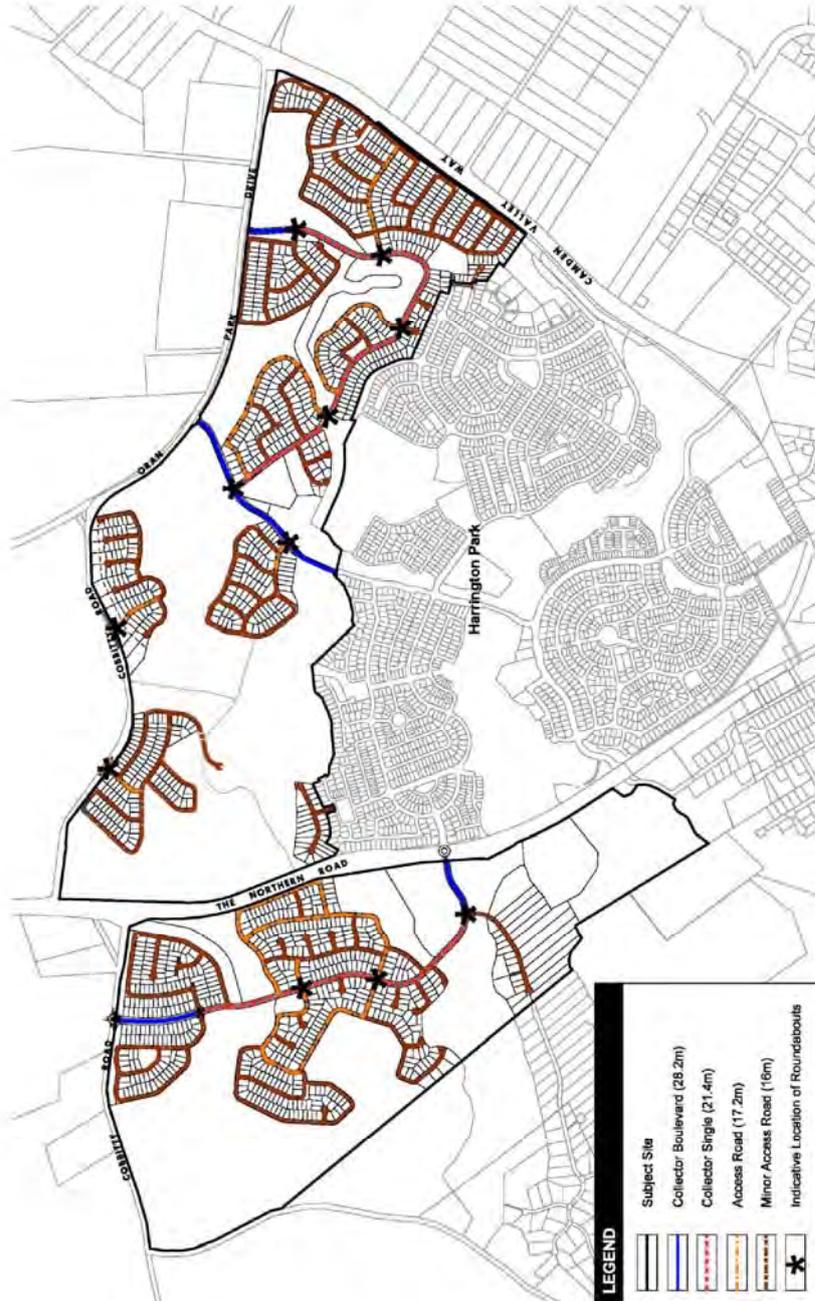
Harrington Grove Indicative Road Hierarchy Plan
